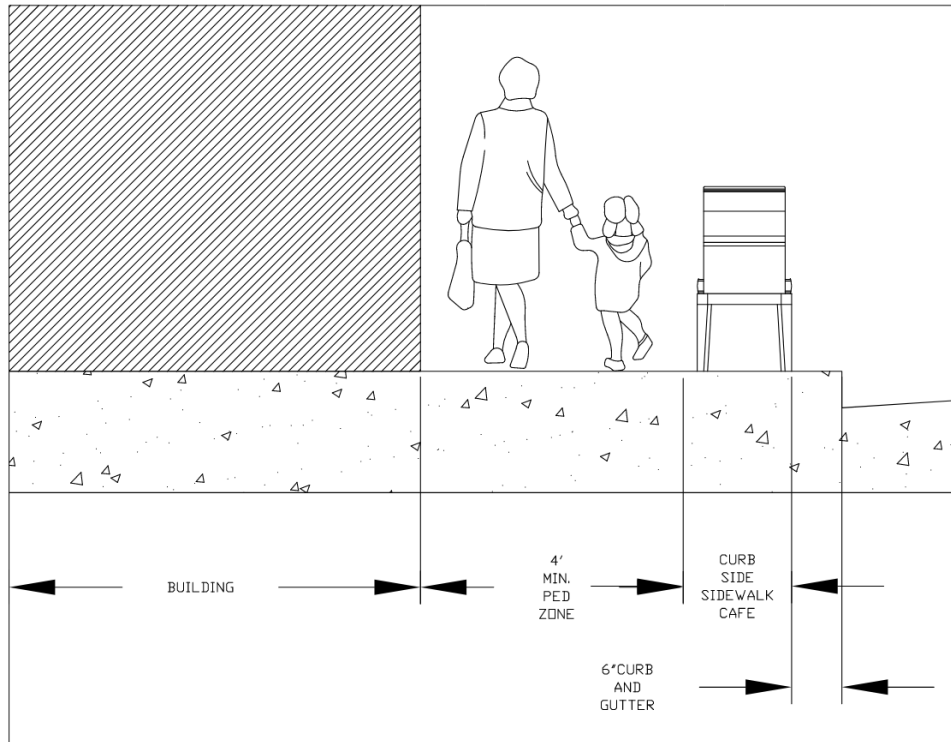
Example Cross Section of Curb Side Sidewalk Café
